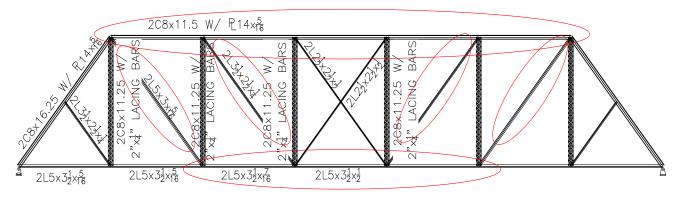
East Truss Members Requiring Strengthening for Vehicular Live Load
